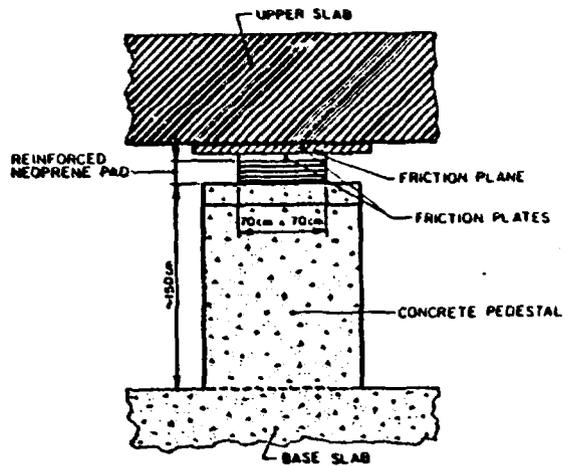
Combined Laminated elastomeric Bearing and Sliding Plates
